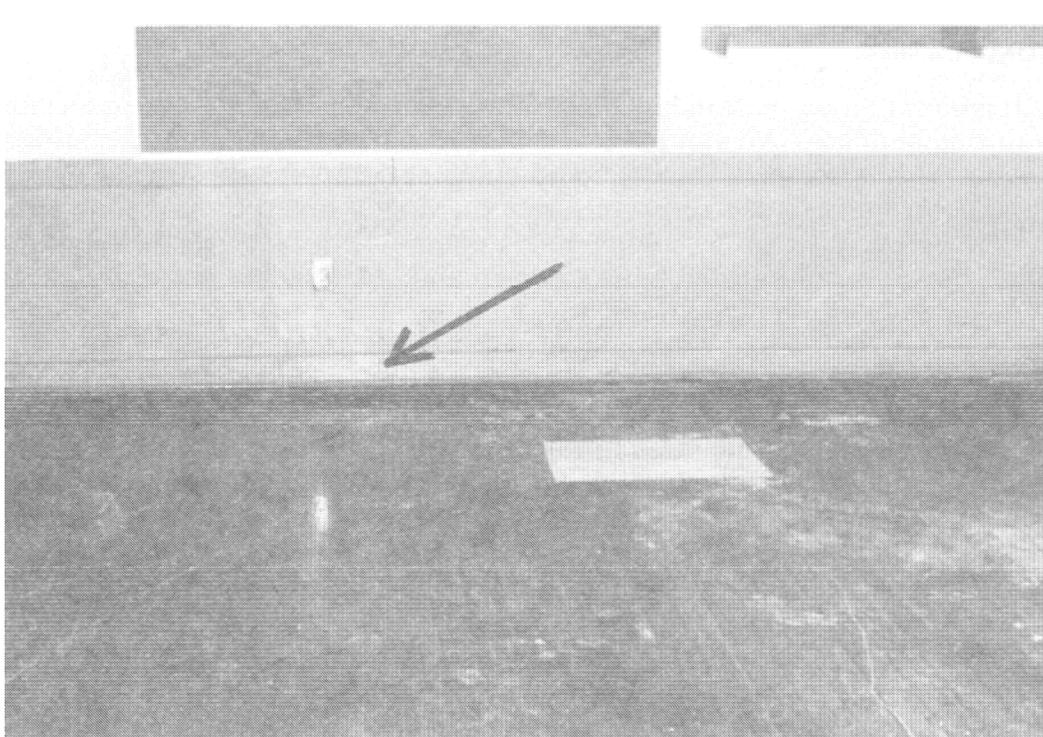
Floor Settlement--Note Separation of Wall from Floor
